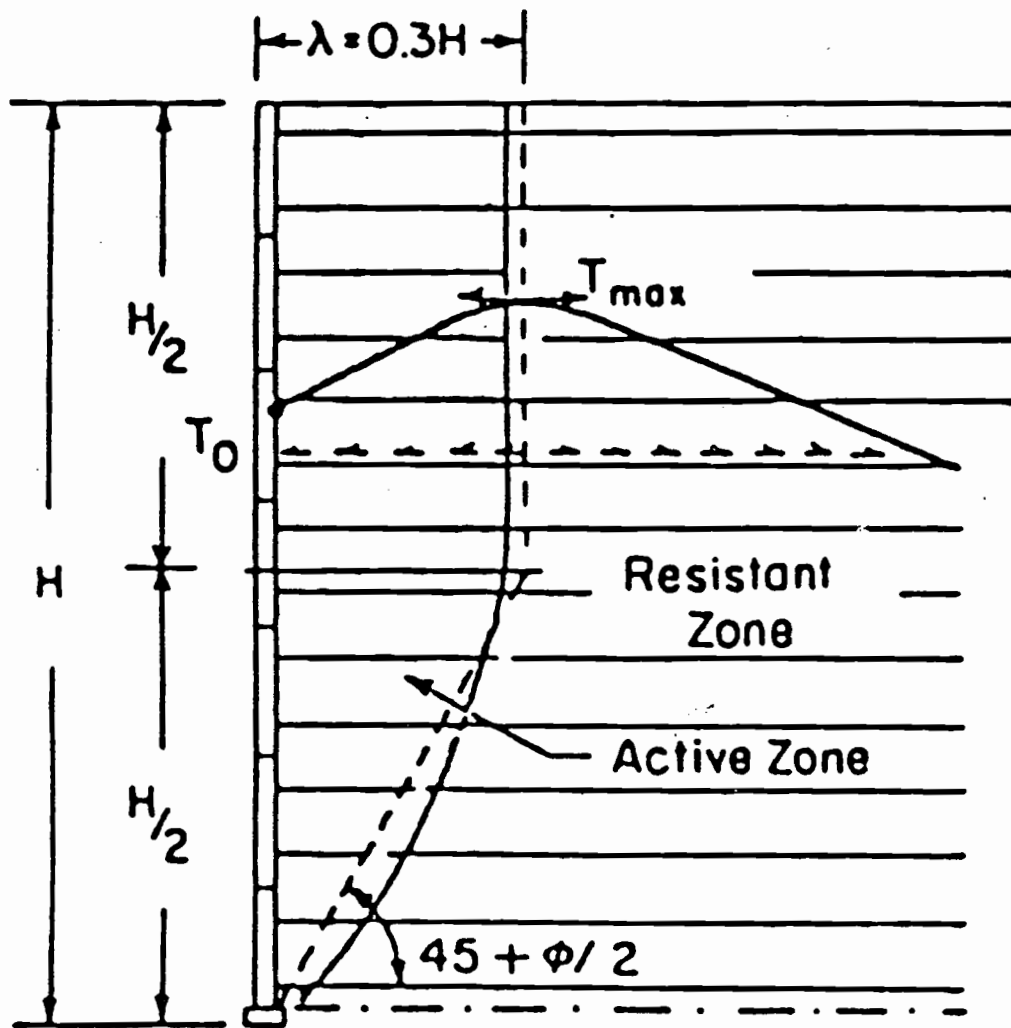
Diagram of a simple rectangular reinforced earth retaining wall with no external loads showing the location of the potential slip surface.
